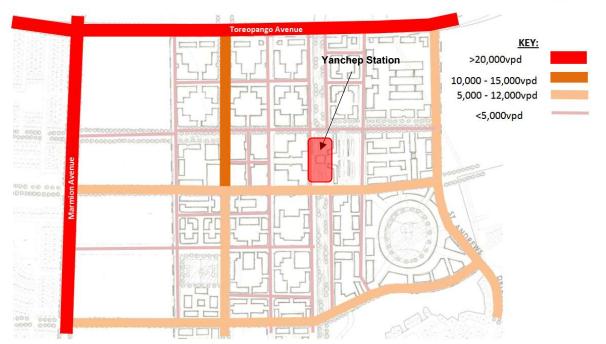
Yanchep Activity Centre Structure Plan – Forecast Traffic Projections
